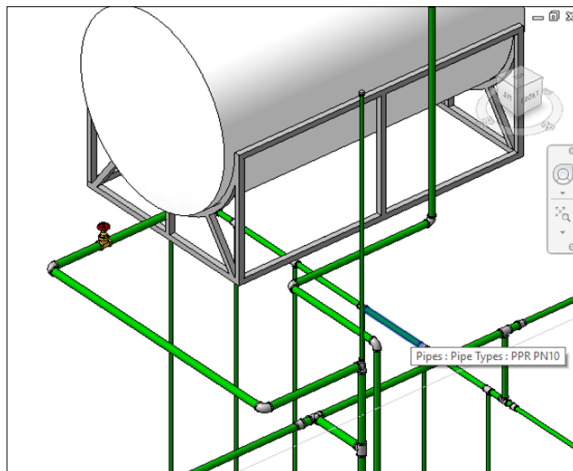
Installing a water tank, an inlet pipe into the tank and an inlet pipe into the system
